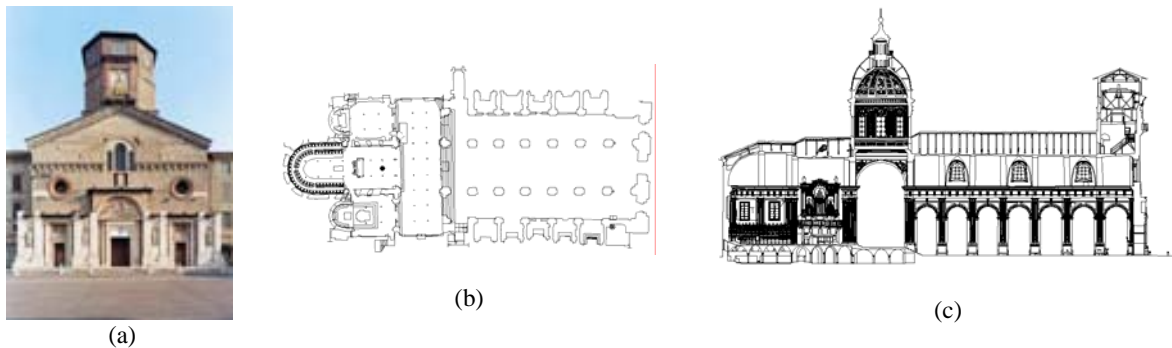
Geometry: (a) photo; (b) plan; (c) longitudinal section [Source: Studio Severi, Reggio Emilia]
